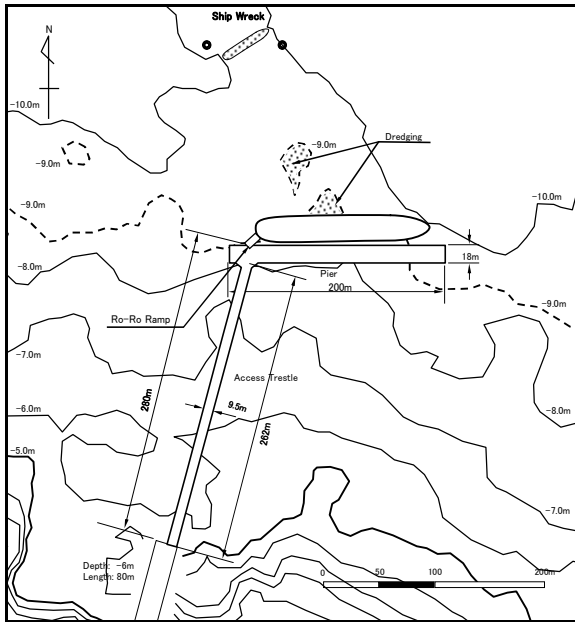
(a) Layout of Basic Plan and Alternative(3)
